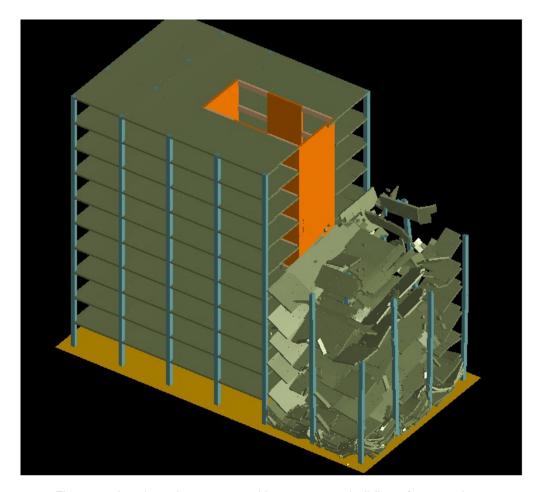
Interior column removed in a 10-storey building of span ratio 1. (at 6.25 sec of the analysis)
